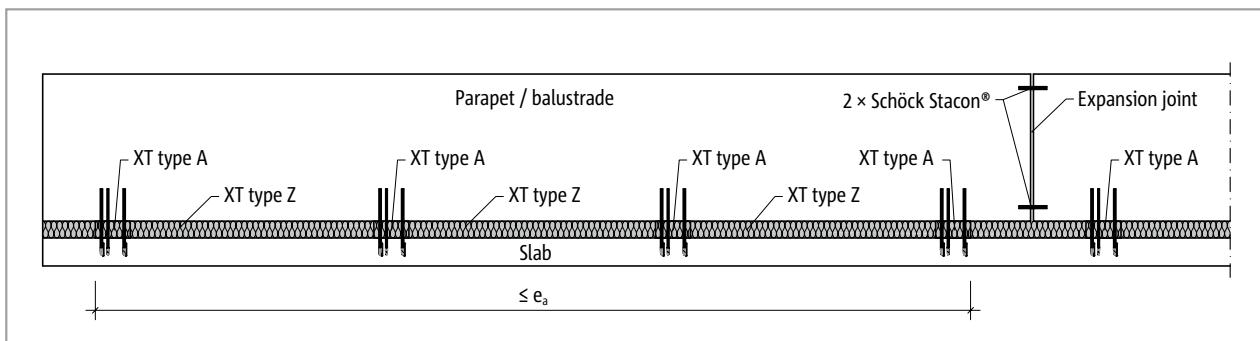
Schöck Isokorb® XT type A: Expansion joint arrangement
